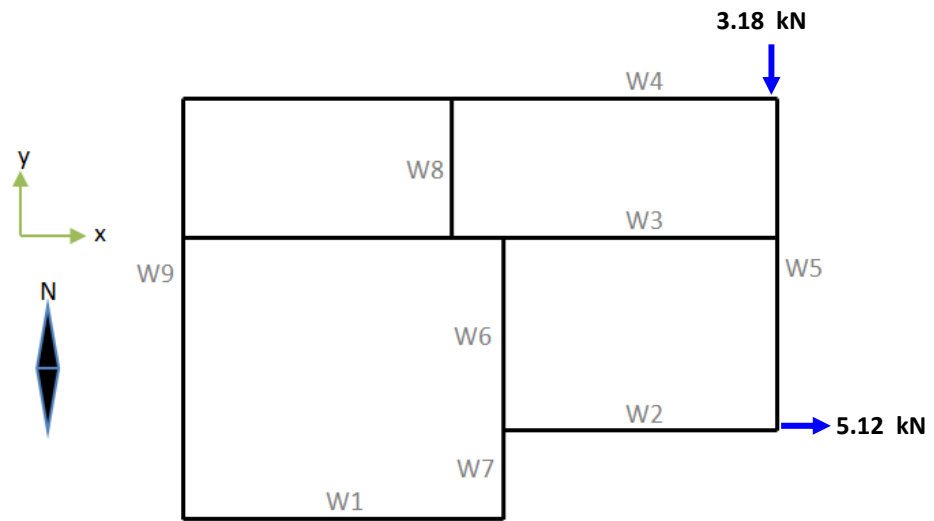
Load Case 10 – 5.12 kN Applied to Top-Plate at Wall 2 and 3.18 kN Applied to Top-Plate at Wall 5
